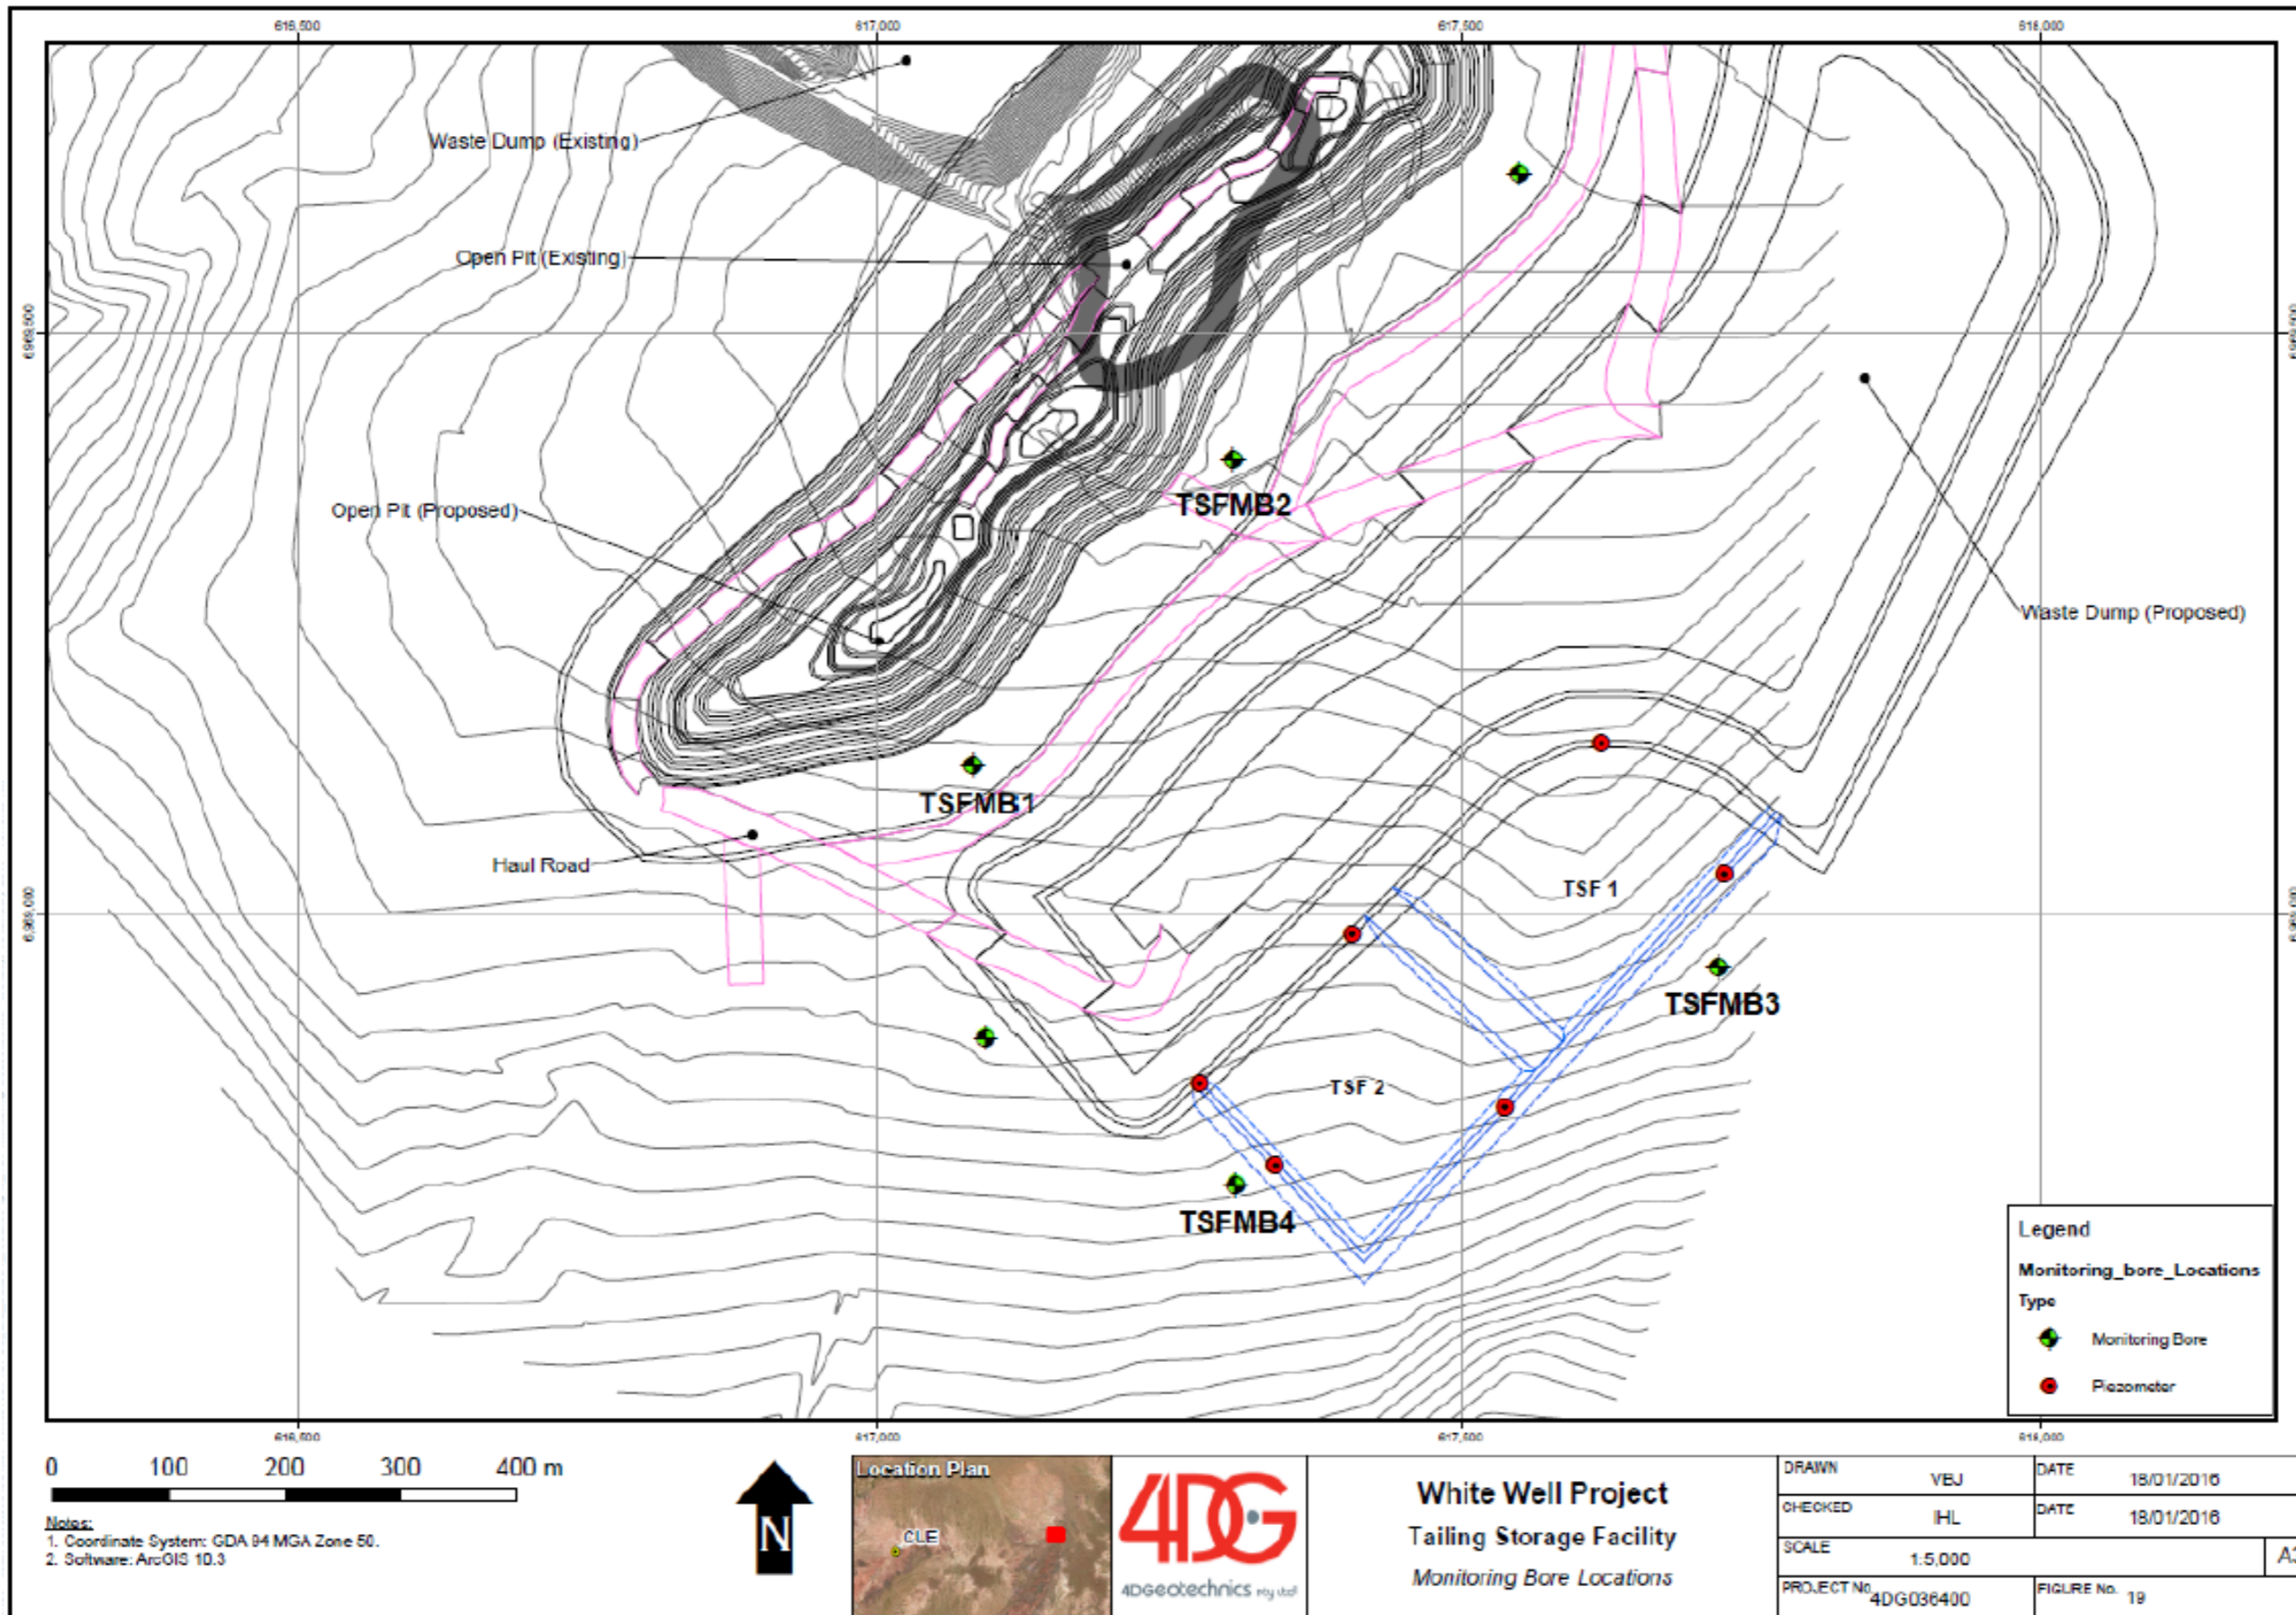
Tailing storage facility (TSF) and monitoring bore locations
